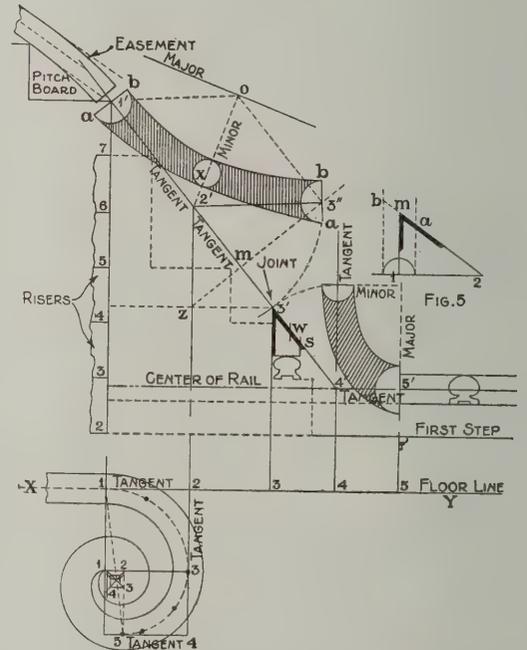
Showing How to Handle the Tangents and Draw Face Molds Over Plan Fig. 1
